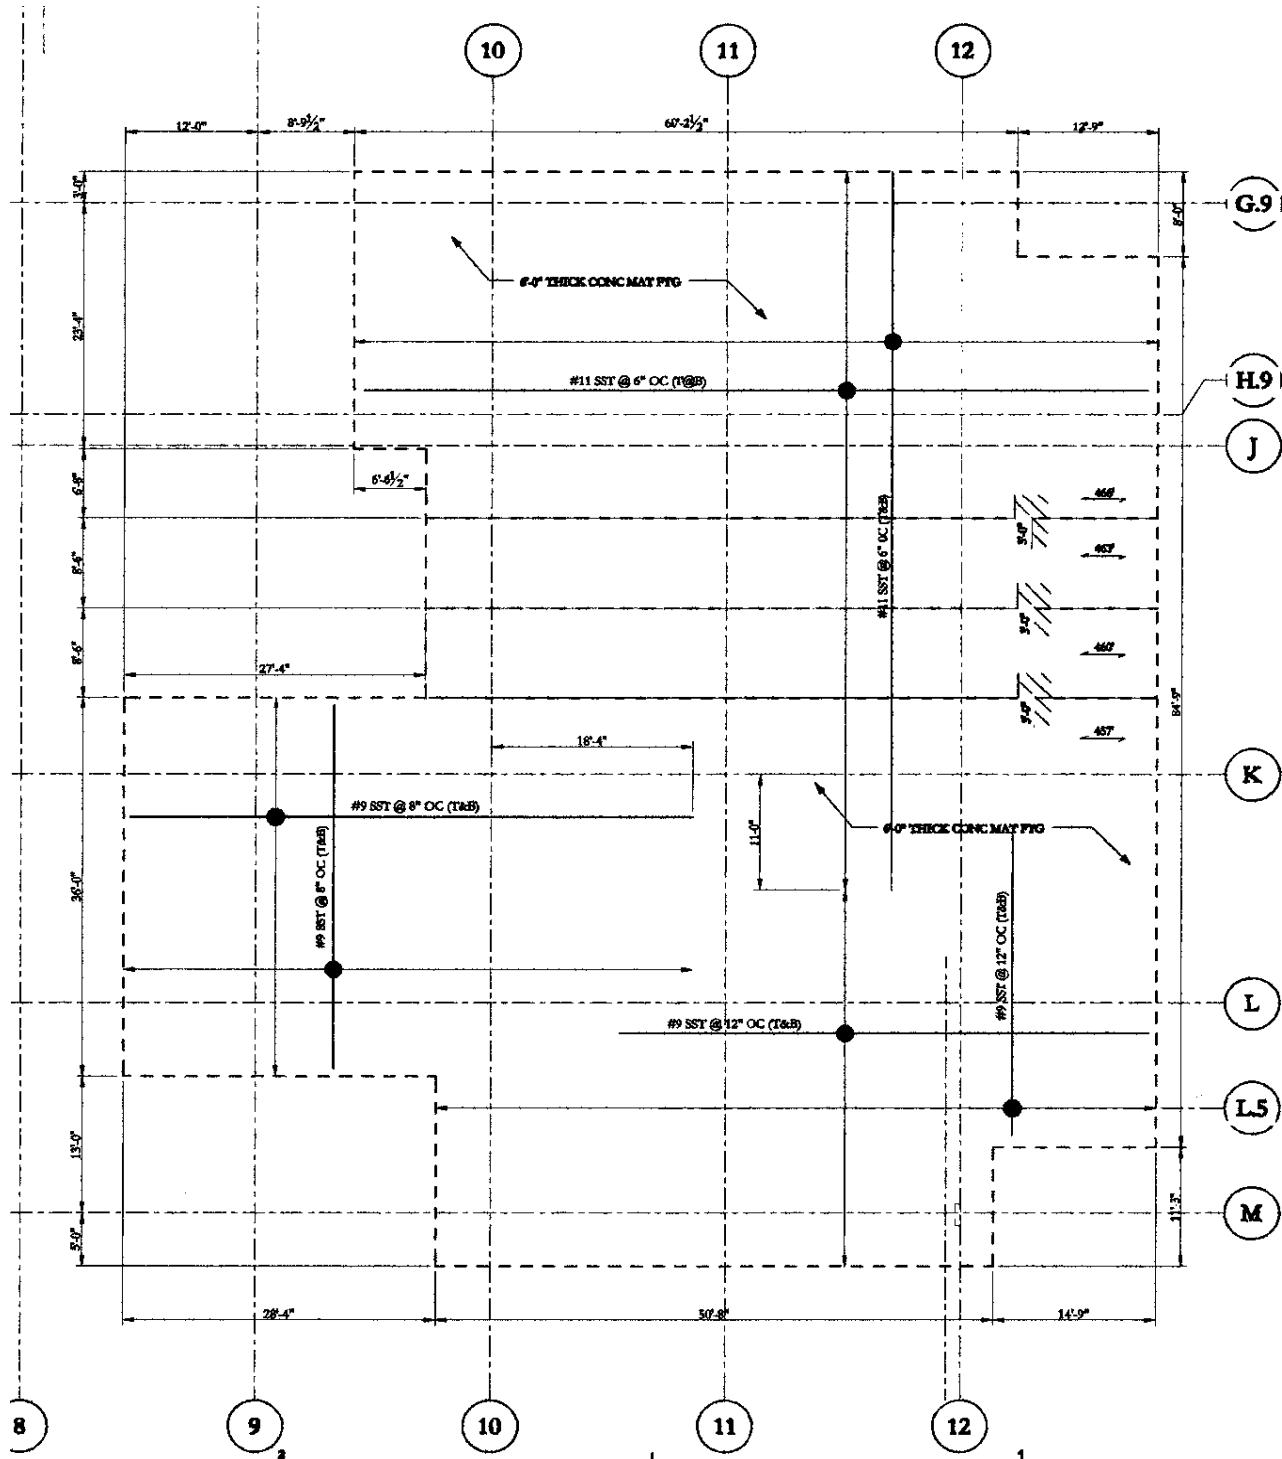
Typical Mat Foundation under Imaging Equipment
